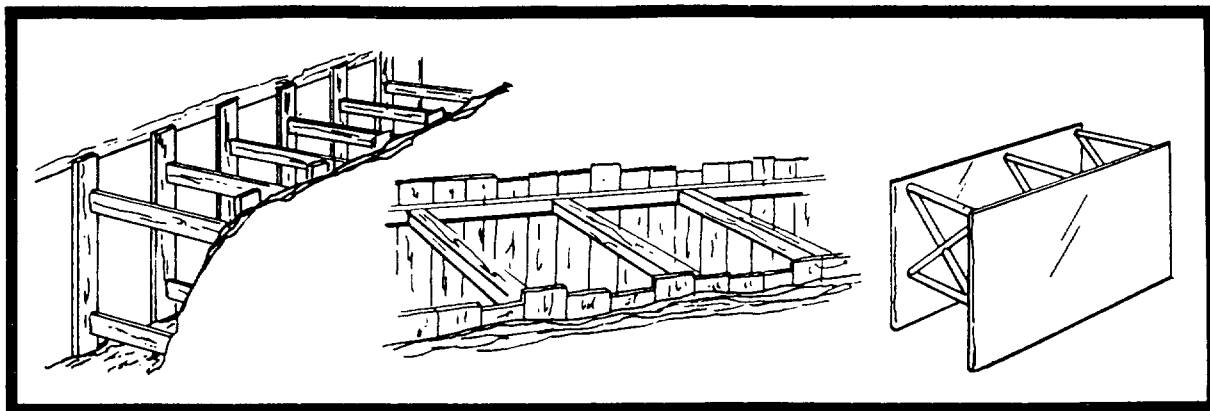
Examples of trench sheeting. Left, open; center, closed; right, movable shield.
